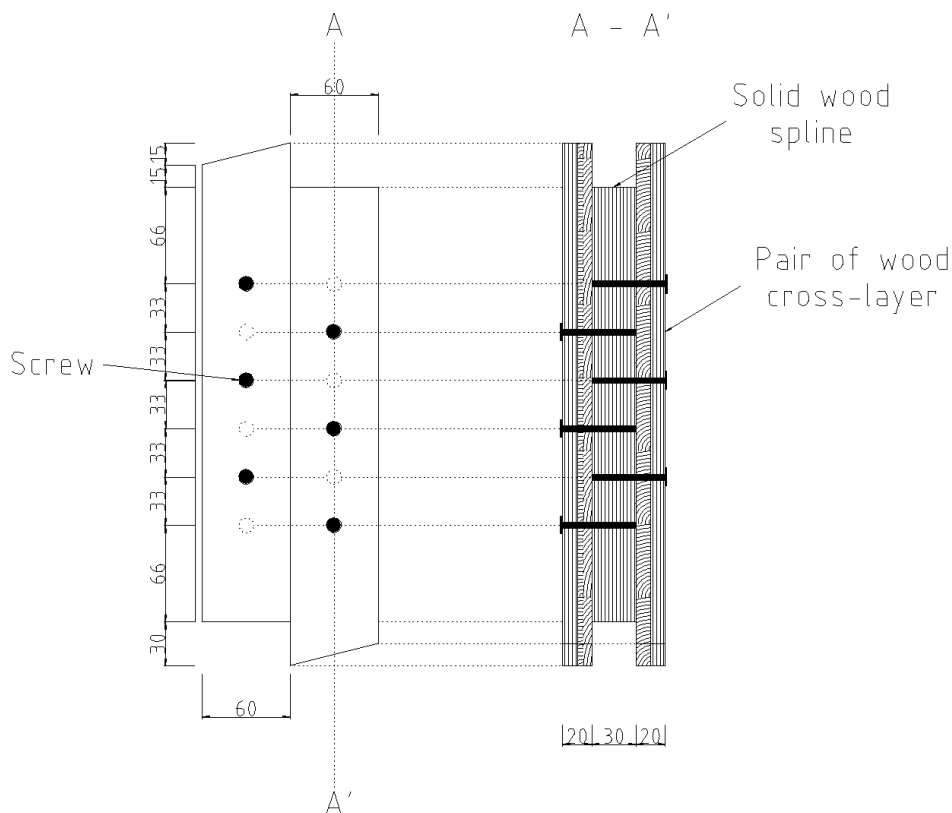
Specimen layout and dimensions (in mm) of the single internal spline wall-to-wall connection.
